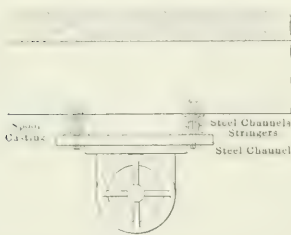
Structural-Steel Stringers Supported from Steel Casting.
